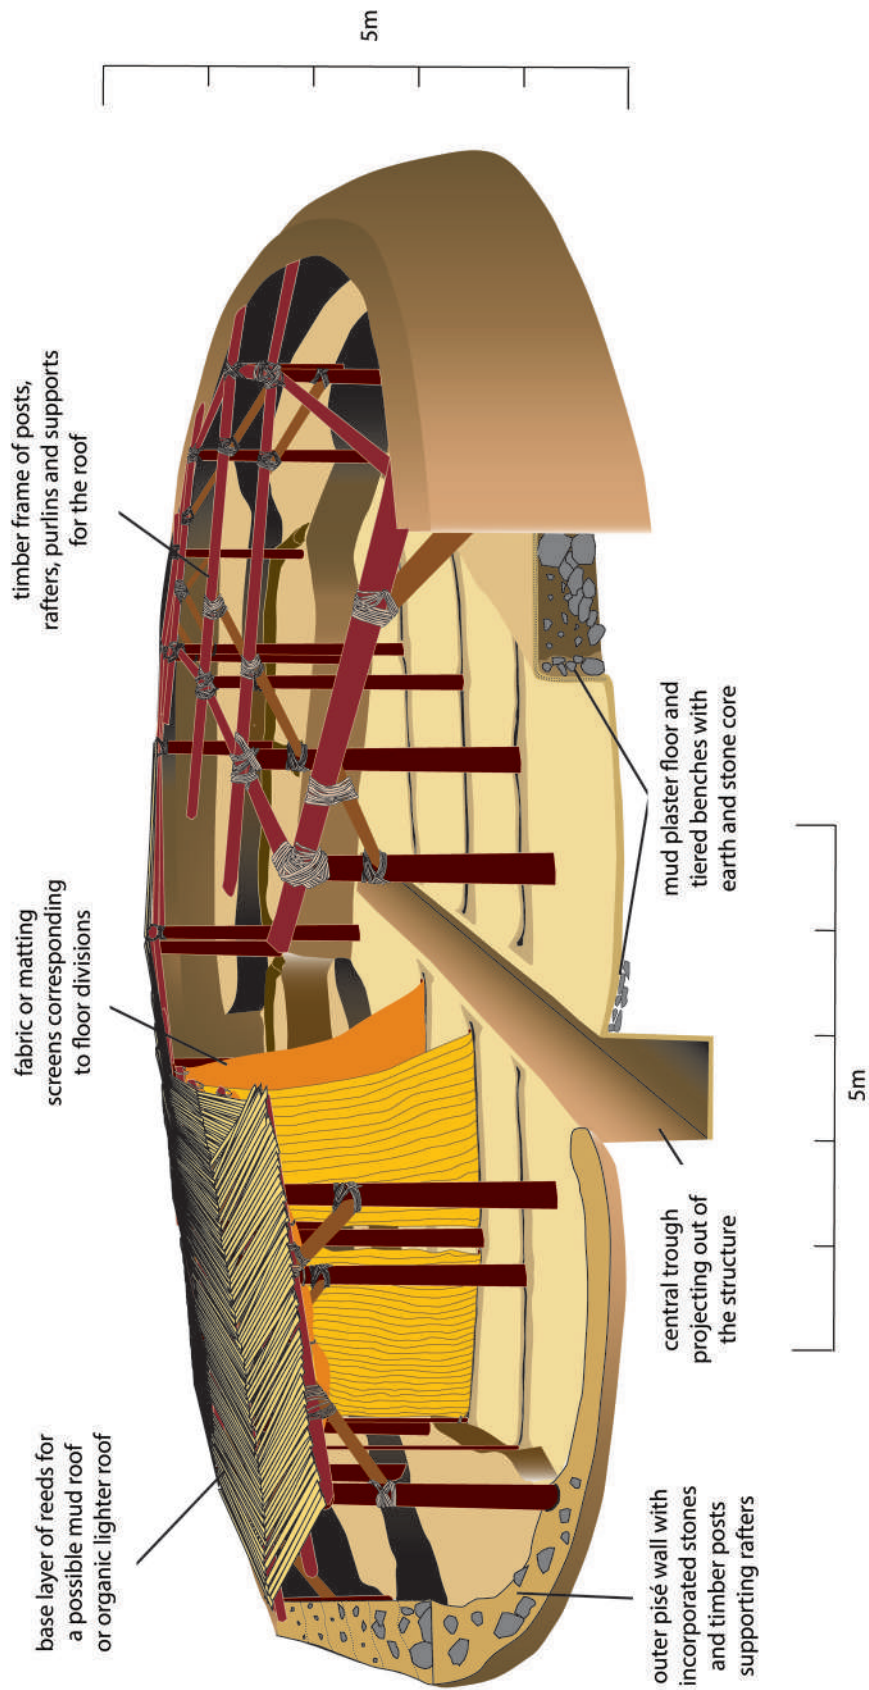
Partial reconstruction of Structure O75 showing construction methods used in the construction of the walls, benches and mud-plaster surfaces, and possible roof construction based on Profile 4 in Figure 43.11
